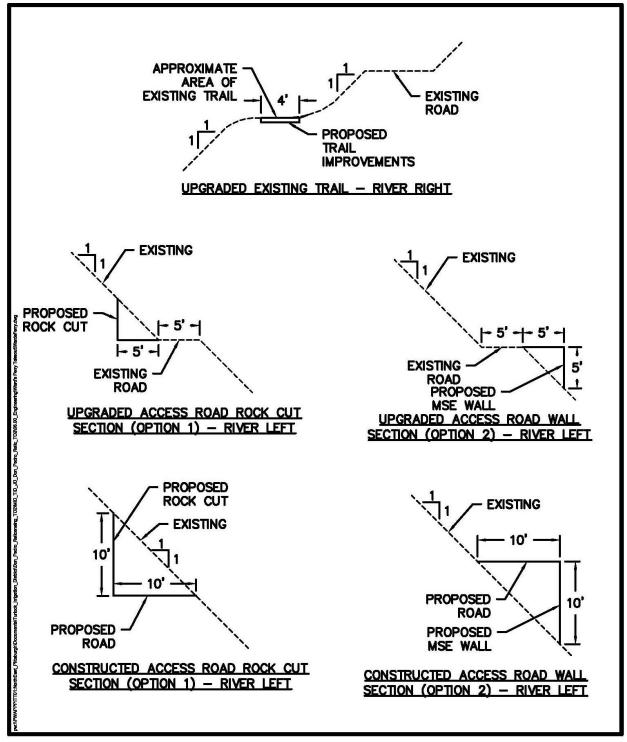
Ward's Ferry Bridge Whitewater Boating Take-out Improvements Conceptual Design, River Left Options - Typical Sections.
